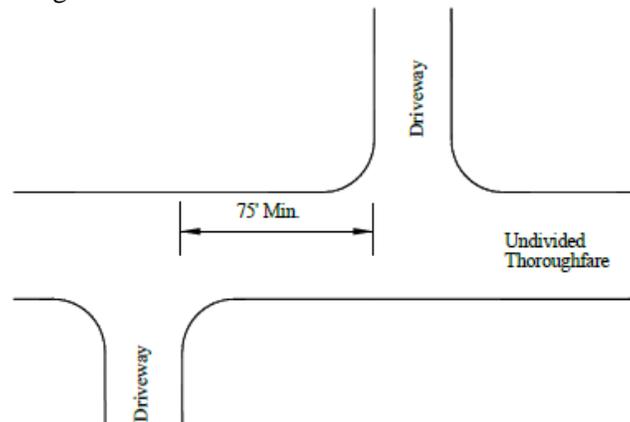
Driveway Spacing on Opposite Sides of an Undivided Street
